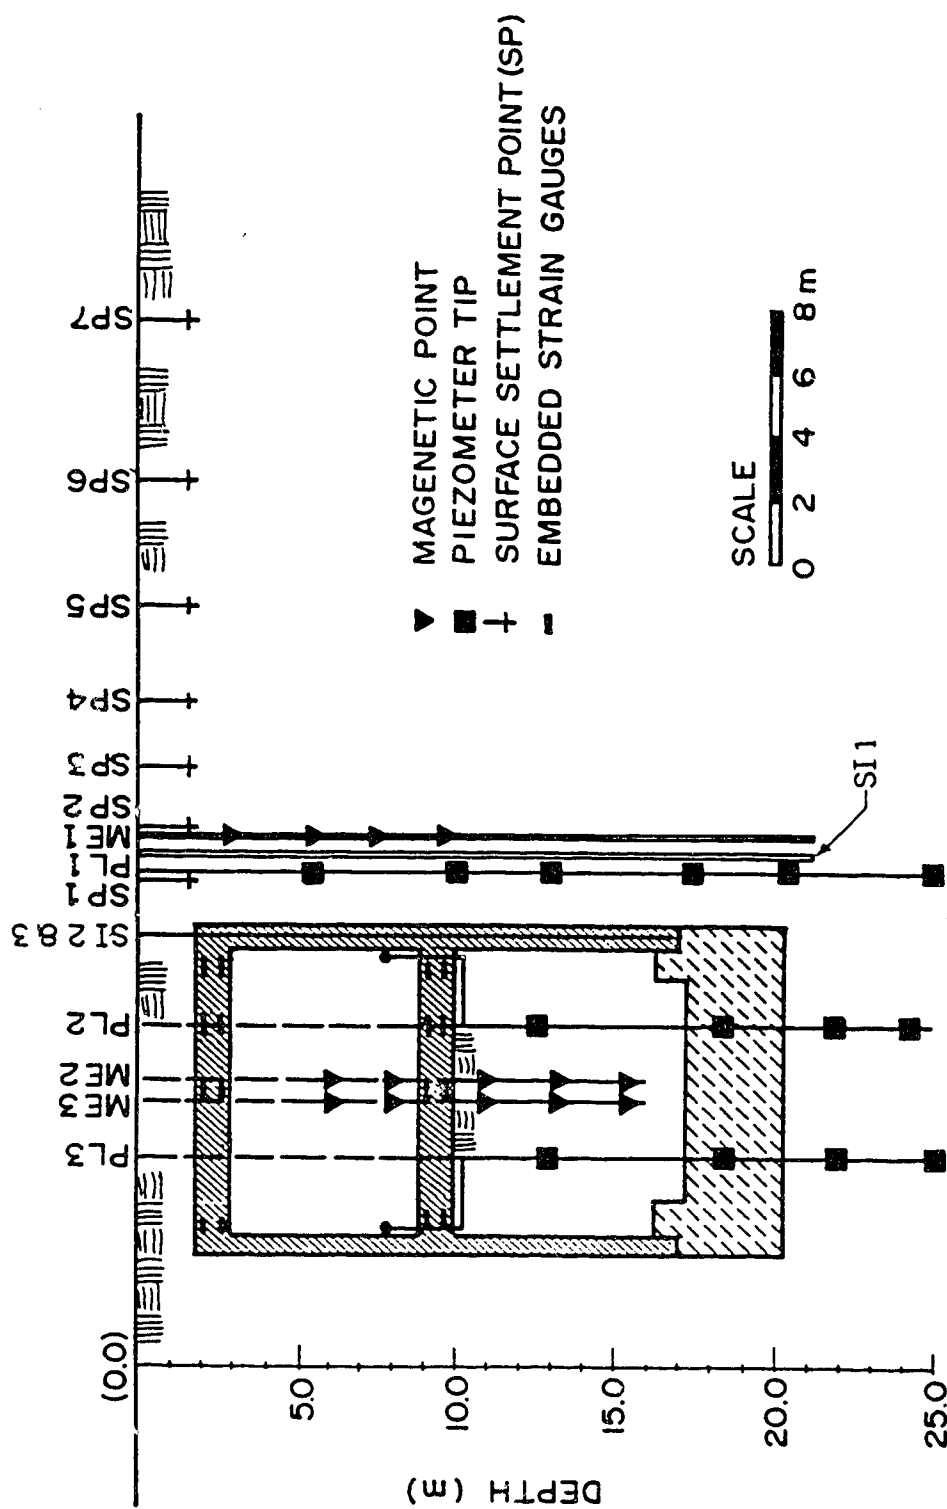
The Tunnel Test Section - Cross-Sectional View of the Instrumentation
